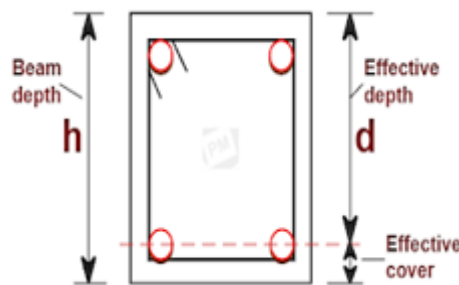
4. Example of transversal slab section with longitudinal reinforcement
